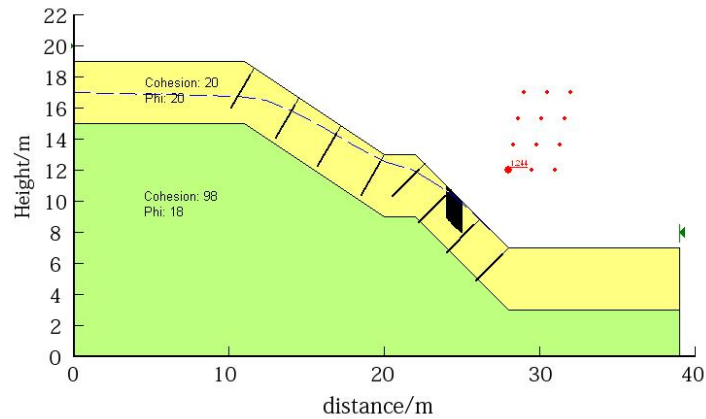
Stability of expansive soil slope after reinforcement(the length of anchor is 3m)
